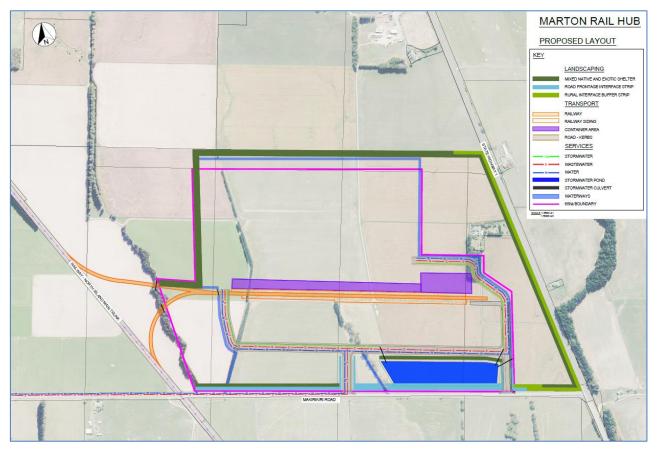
Comprehensive Development Plan - Concept Plan and Layout
